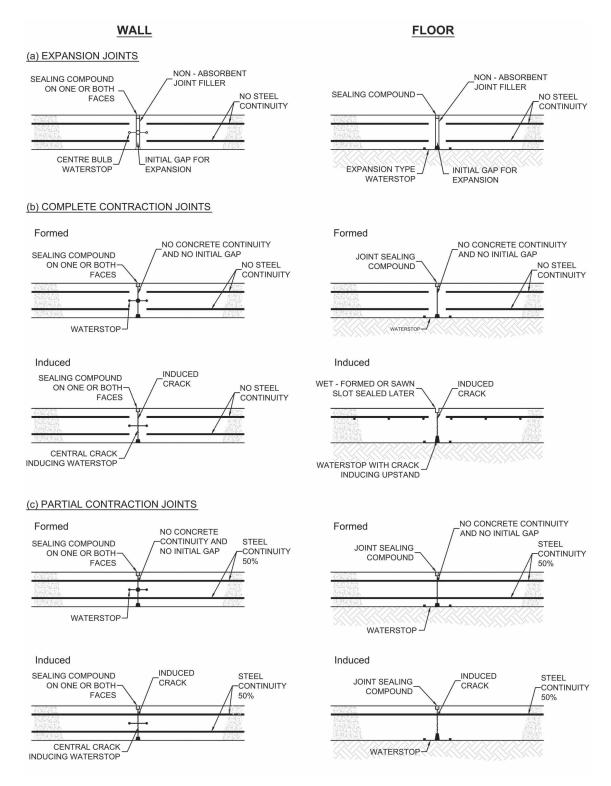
Typical details for expansion and contraction joints for the walls and bases of in situ reinforced concrete walls and bases (from BS 8007:1987)
